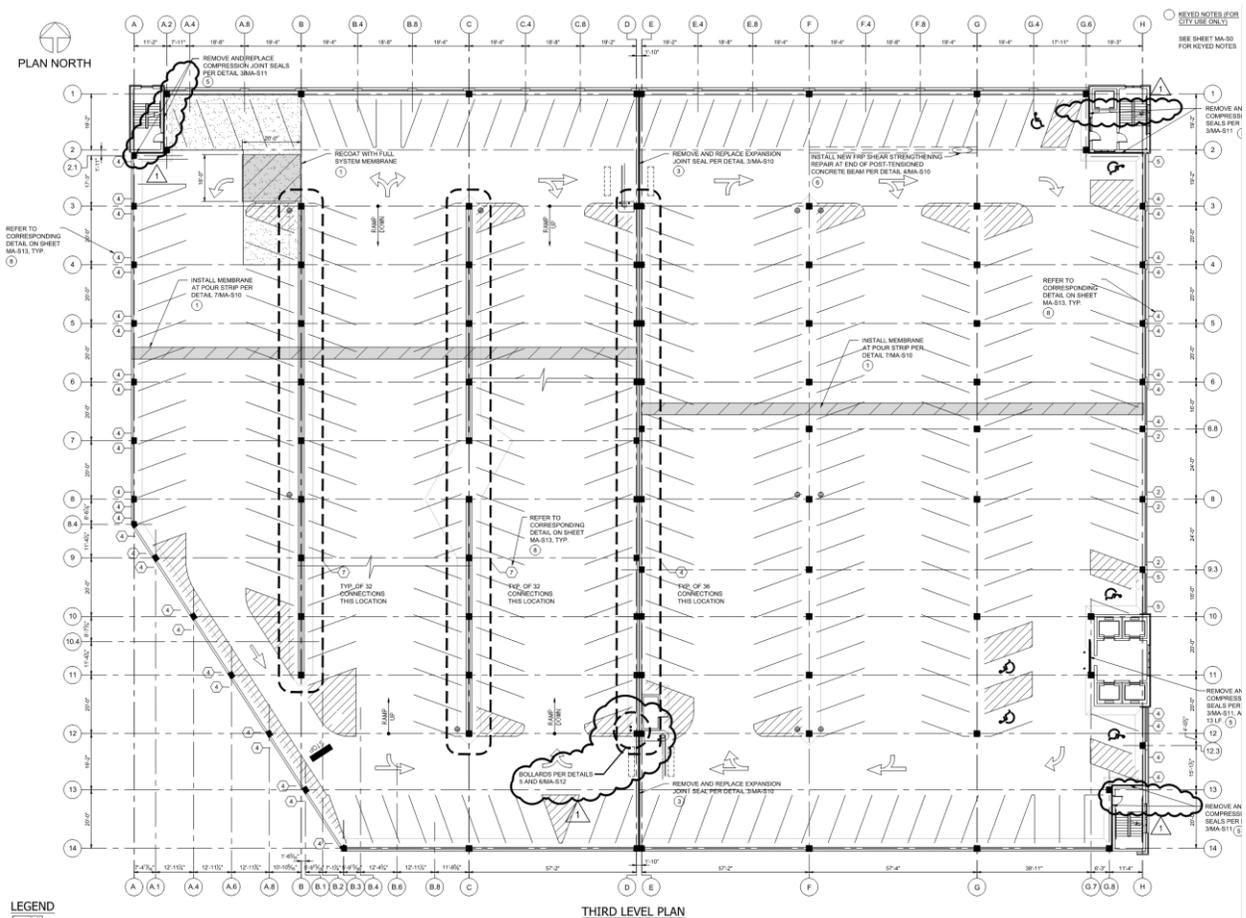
Plan View of a typical floor of the Maple Avenue Parking Garage (Third Floor shown)
